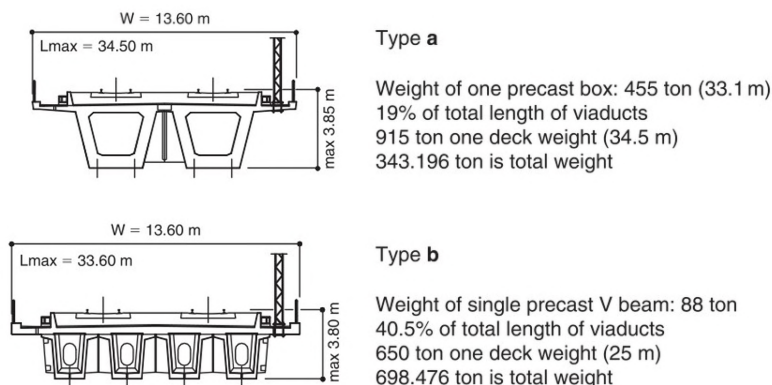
Two box girders deck (a) and four precast V beams and cast in situ slab (b).
